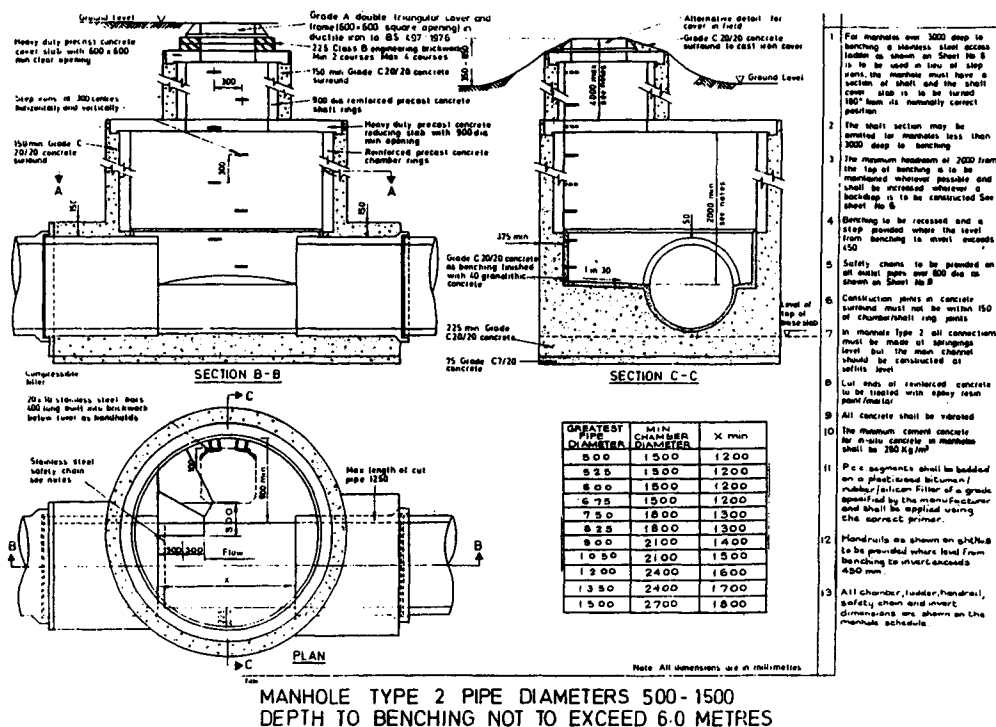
Standard detail drawing for precast concrete manhole (North West Water).
